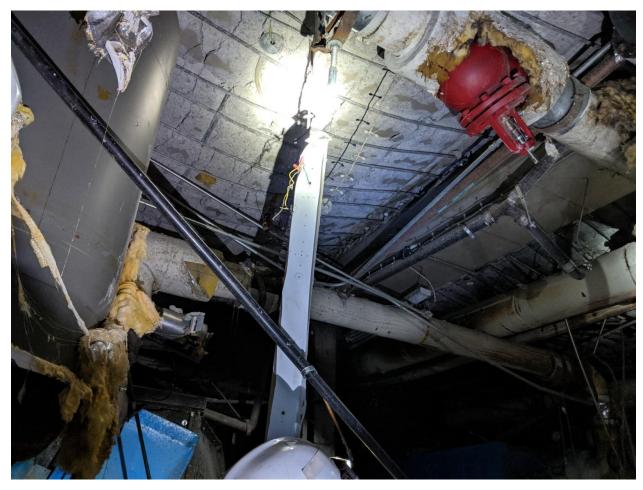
Exhaust assembly from Boiler #1. This is the view inside of the ducting area on the roof of Argenta Hall. Damage is consistent with an explosion occurring within this assembly.
